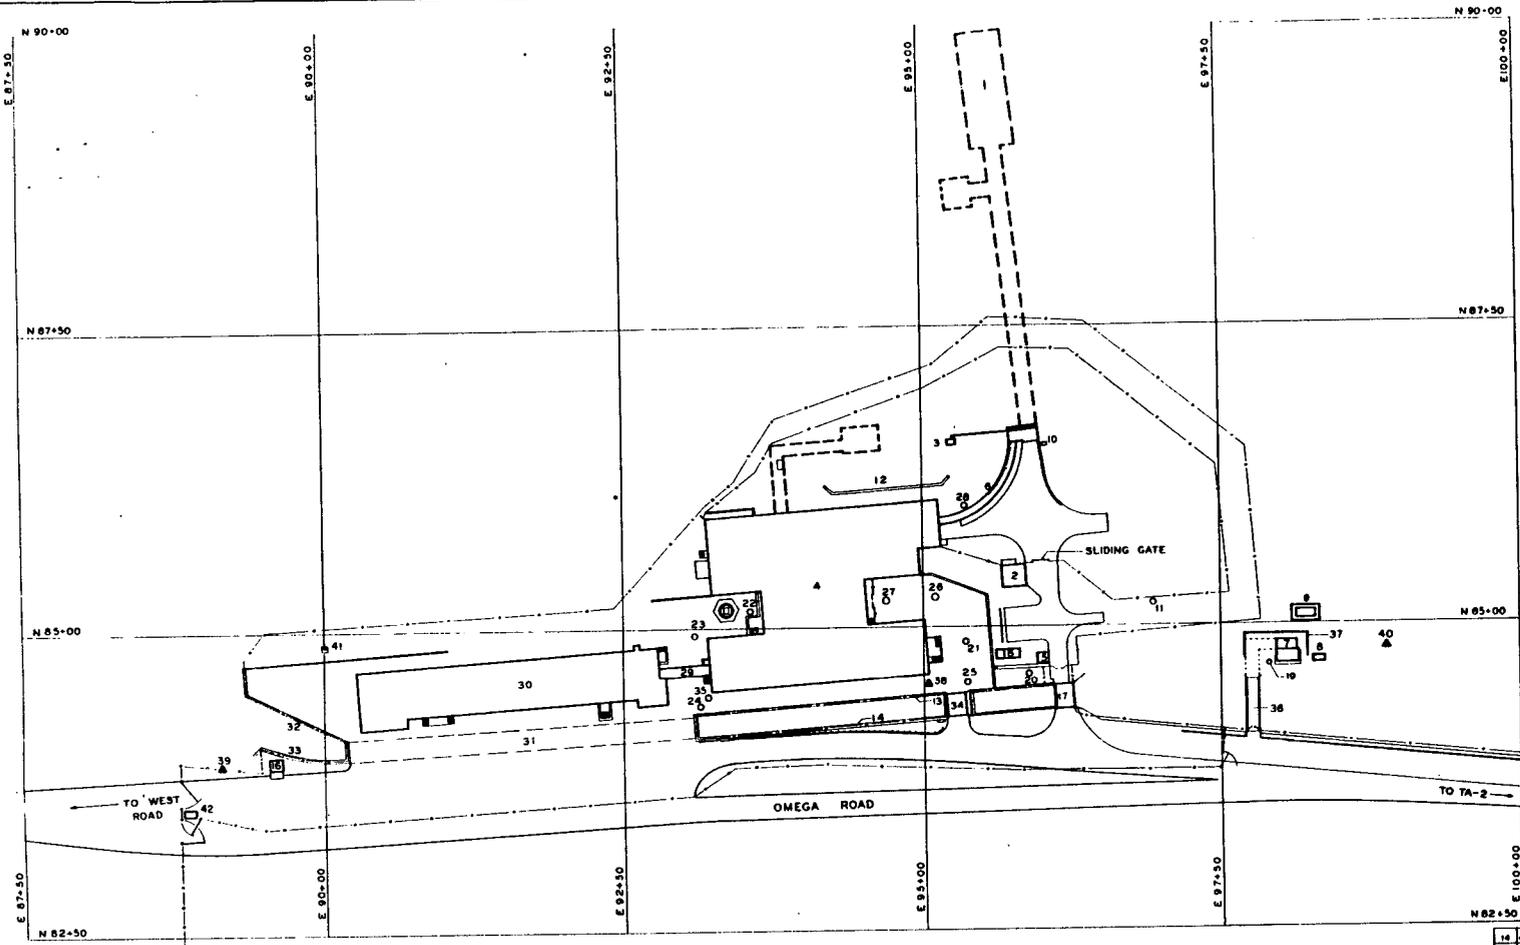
Structure Location Plan for TA-41 - W Site
